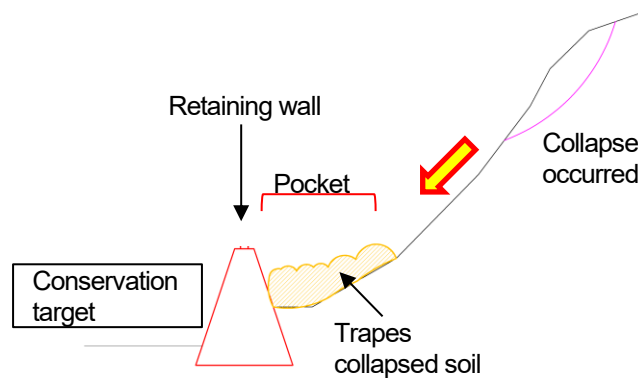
Image diagram of retaining wall type that trapes collapsed soil
